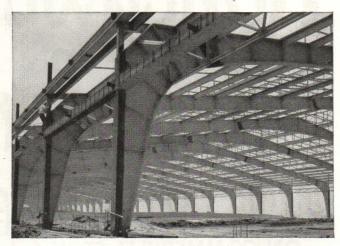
All welded rigid frame Harbor Shed at Long Beach, California. Designed by R. D. Sandham under direction of R. R. Shoemaker, Chief Engineer, and R. J. Amar, Port Manager. Steel fabricated and erected by Pacific Iron and Steel Company of Los Angeles.
